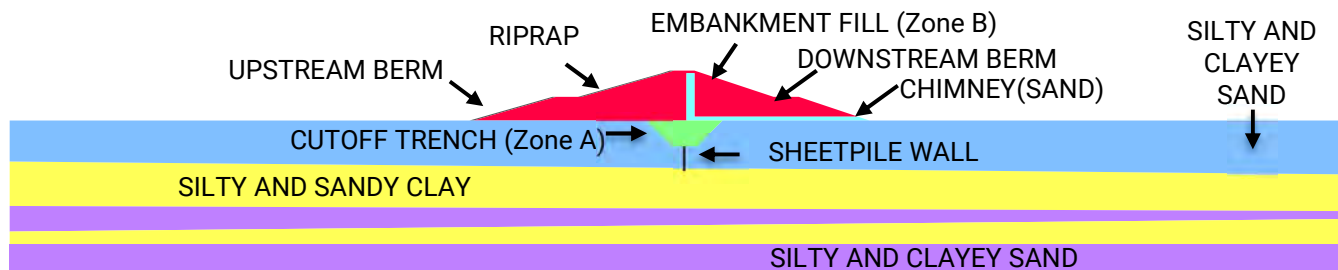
Alternative 1 Embankment Geometry and Zonation— Walnut
